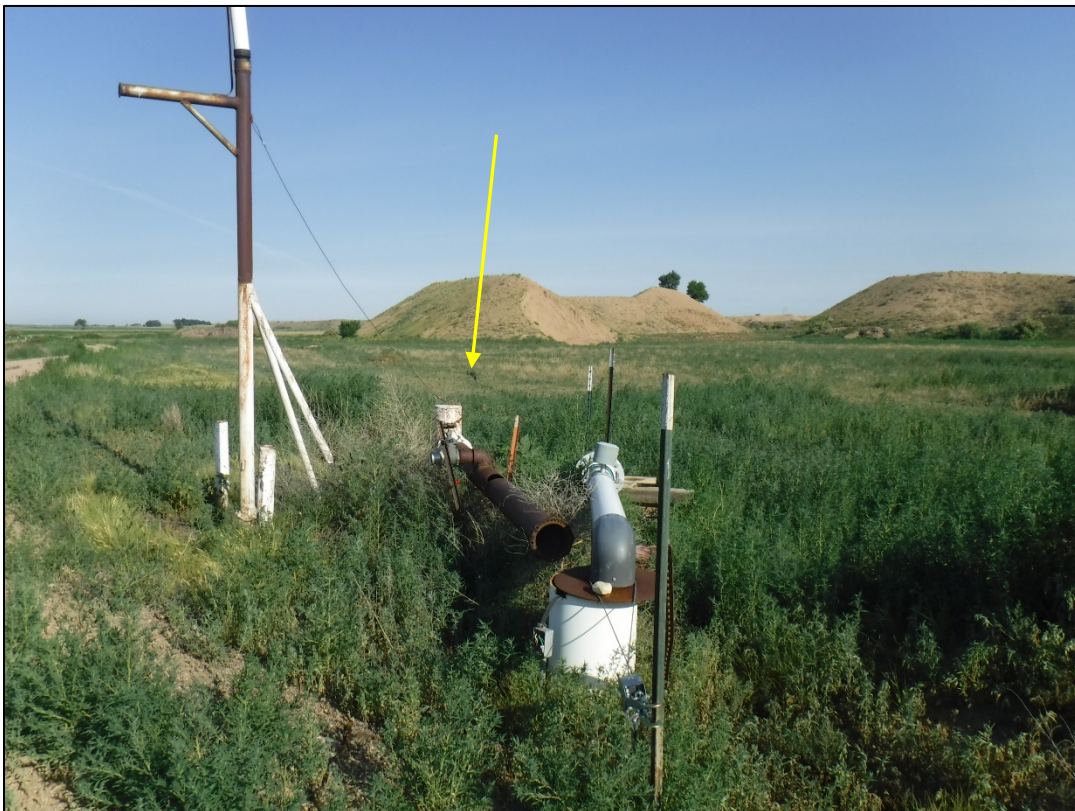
Groundwater well being used to source water for washing gravel, arrow indicates location of piping
